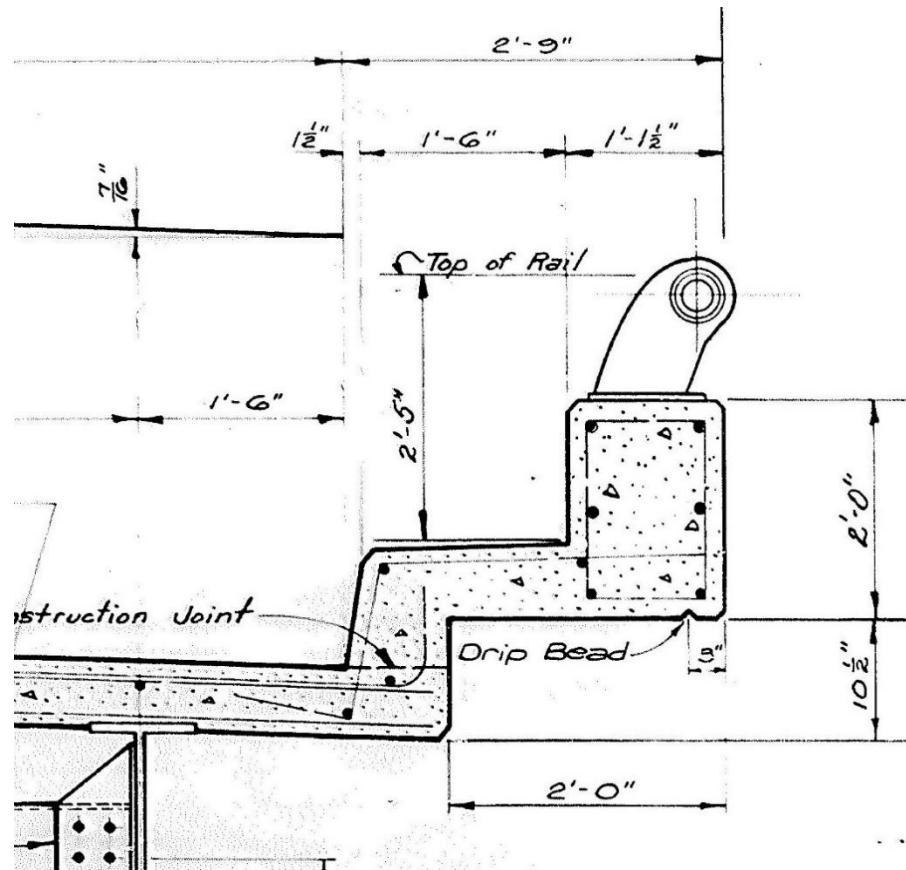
Details from drawing SC15A-60-24P solid concrete parapet with aluminum hand rail (to be removed)
